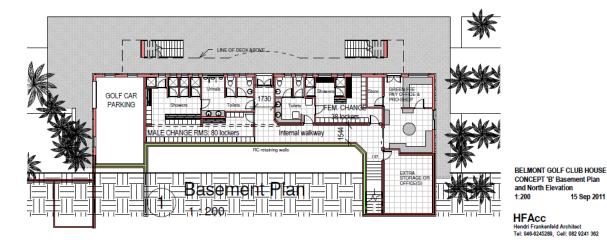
Layout of the Basement of the proposed clubhouse.
